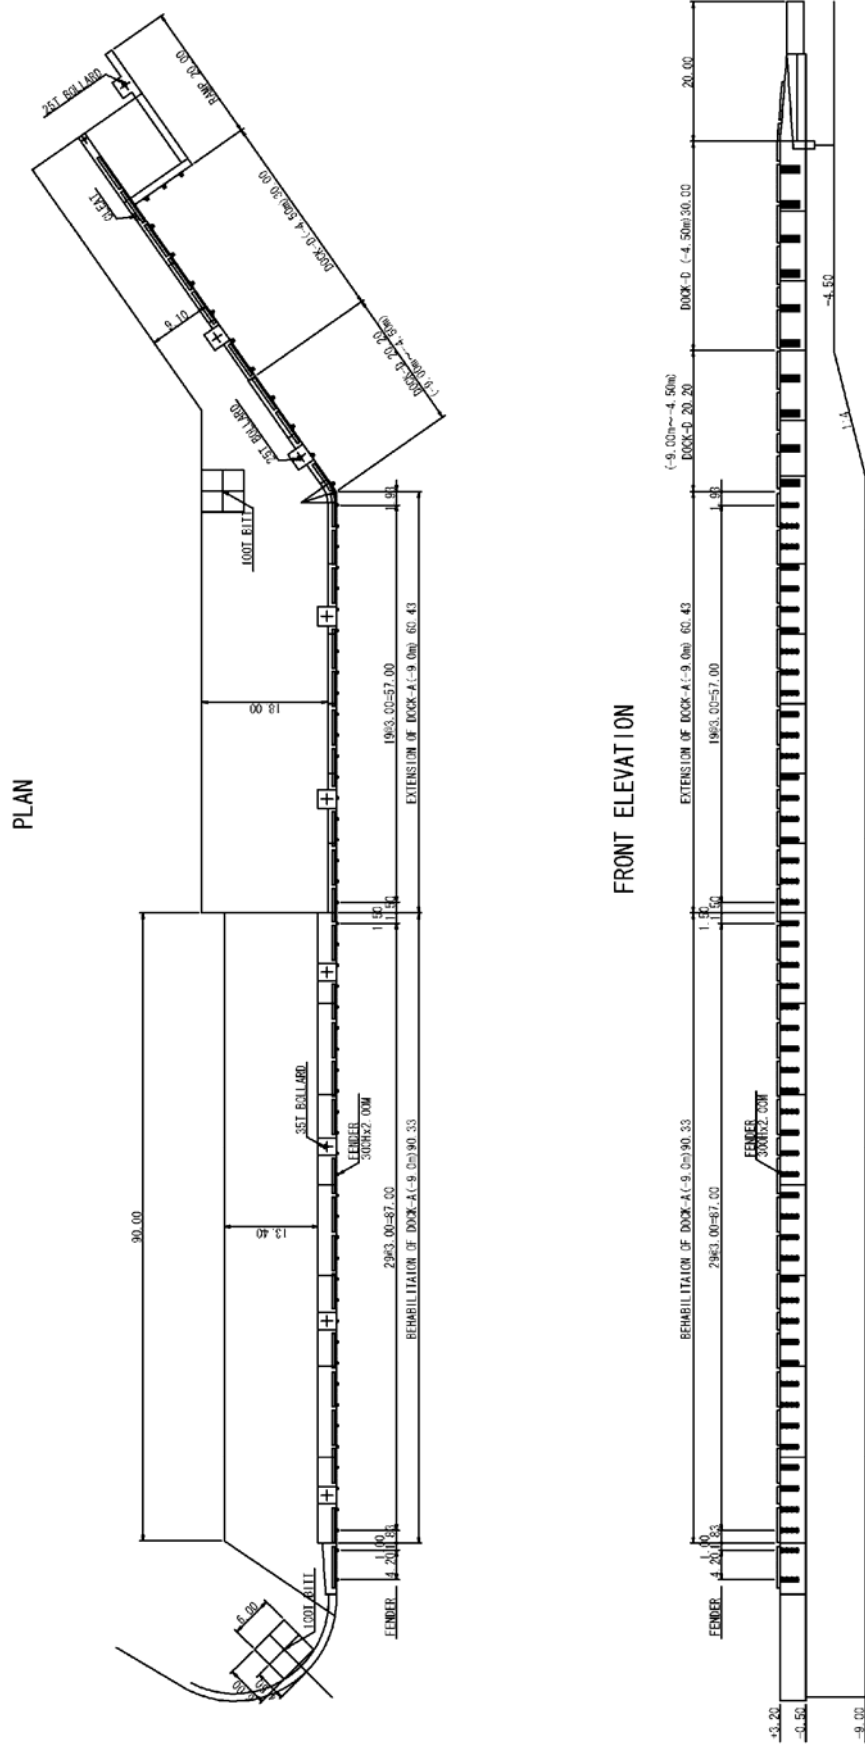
Plan of Improvement of Rubber Fender : Existing A Dock
